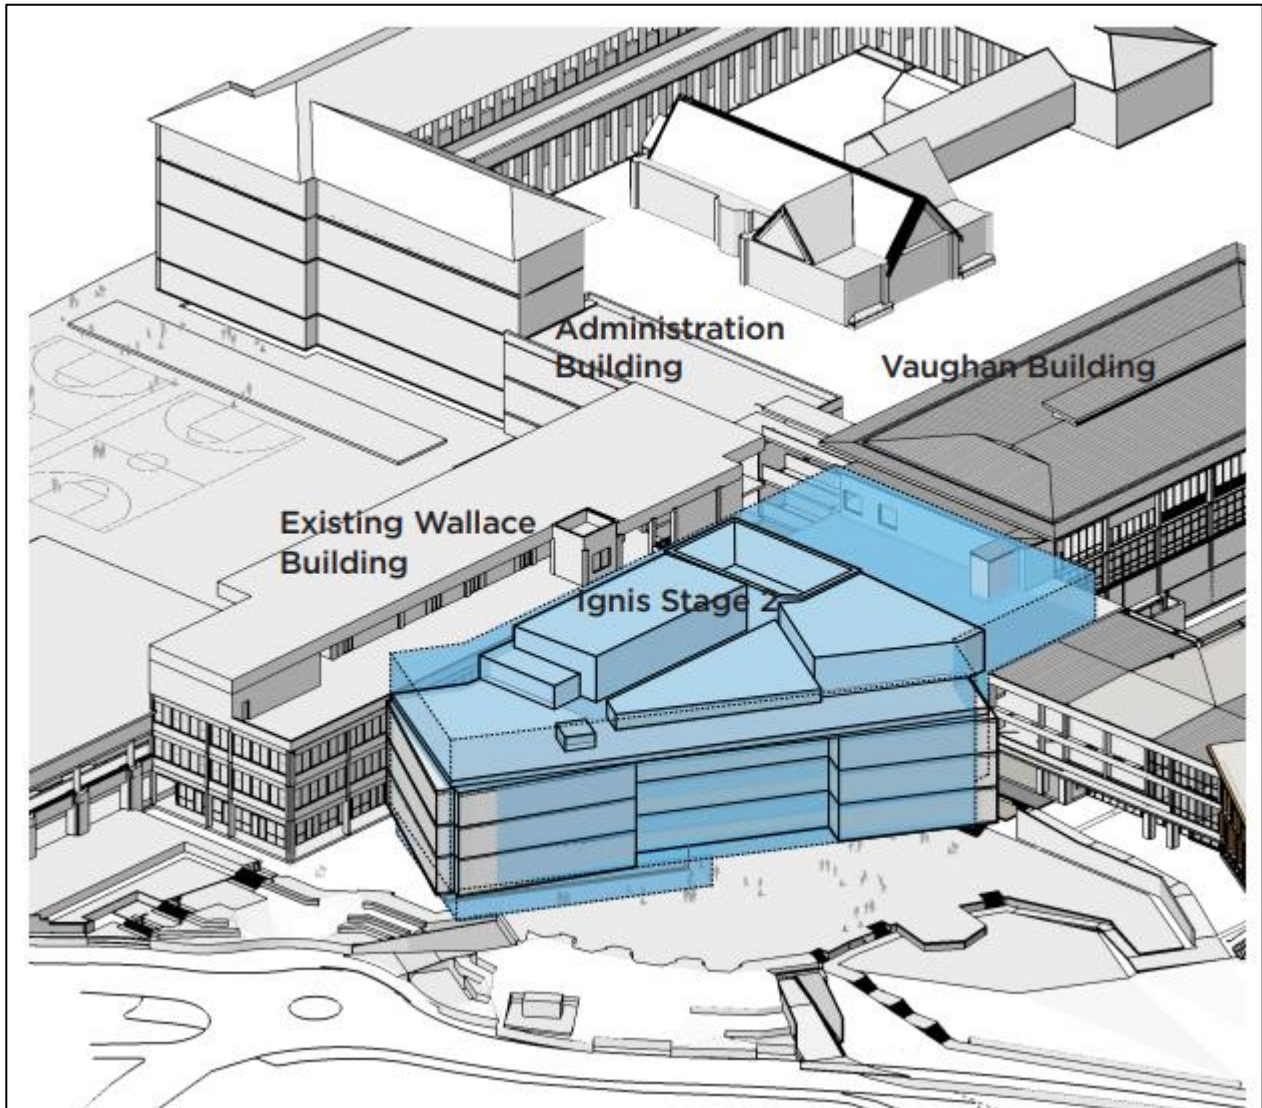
Overlay of Stage 2 and approved Concept Proposal (Source: PMDL Architects, 2021)
